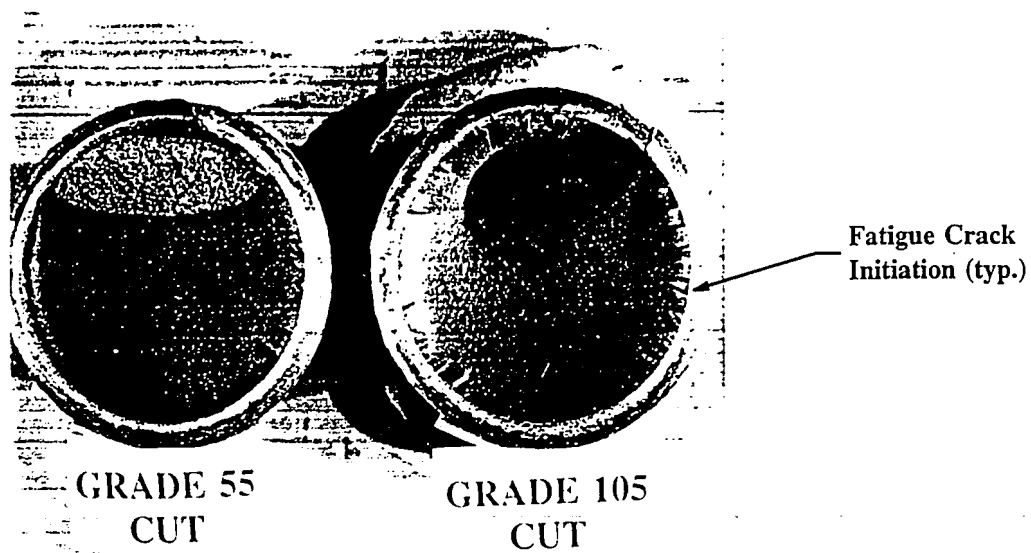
Photographs Showing Typical Cracked Specimens.
